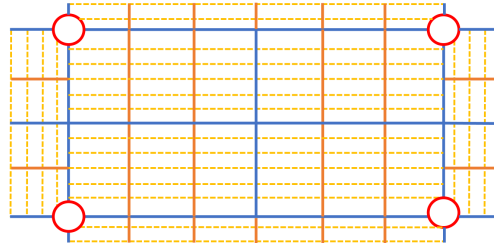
Typical deck layout (Main beams in blue, deck beams in orange and deck stringers in dotted yellow)
